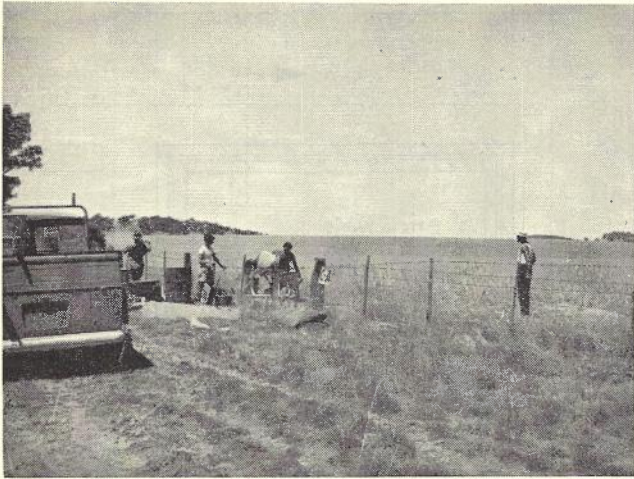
Pouring Concrete Footings on Normal Level Site (Table Top).
